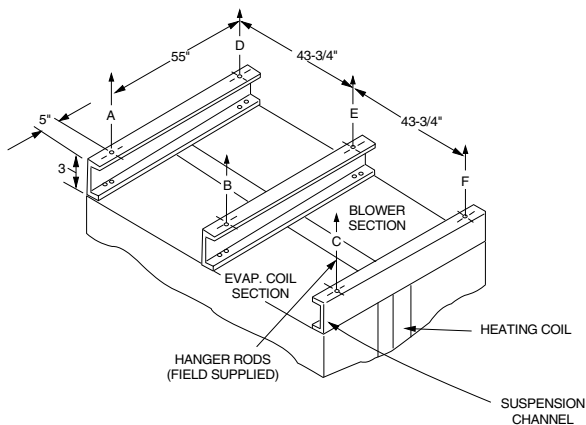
SUSPENSION ACCESSORY ARRANGEMENT (15 TON UNITS)
